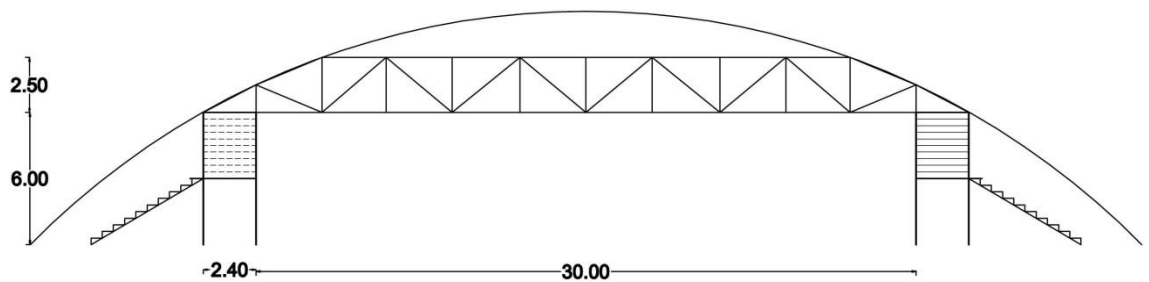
Geometrical dimensions of single span bridge based on Capstone project
